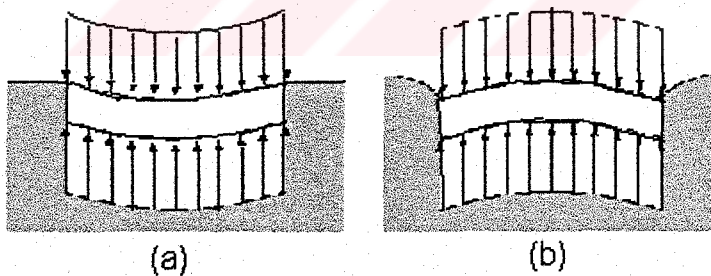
(a) Flexible foundation on clay, (b) Flexible foundation on sand
